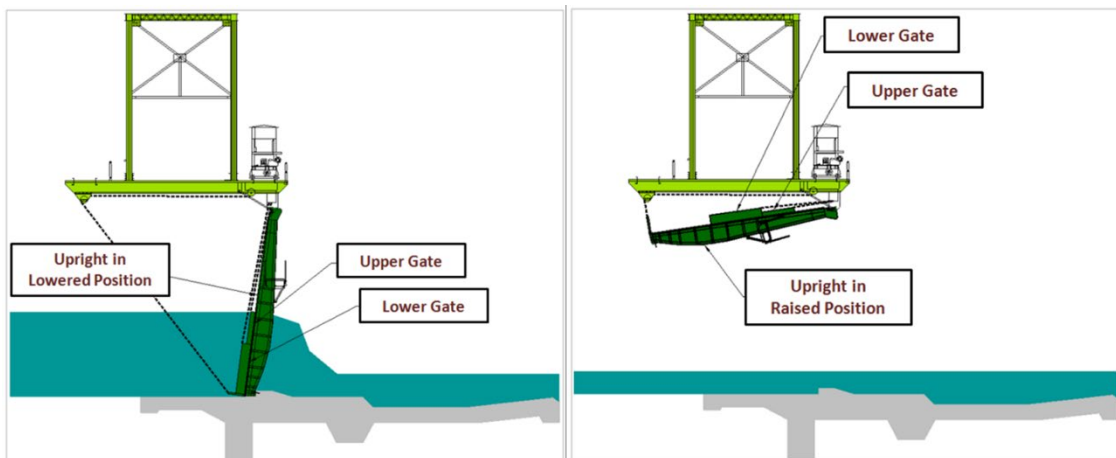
Movable Dam Typical Section – Gates Lowered (left) and Raised (right)
